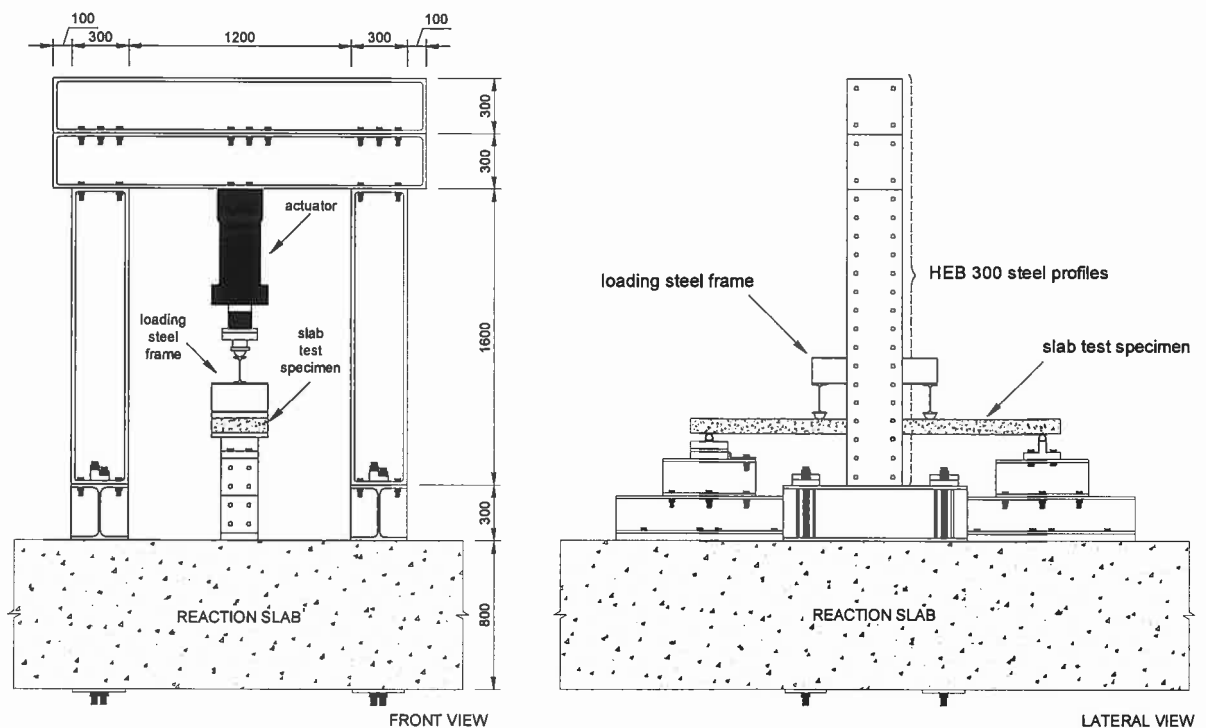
Layout of the four-point bending test (dimensions in millimetres).
